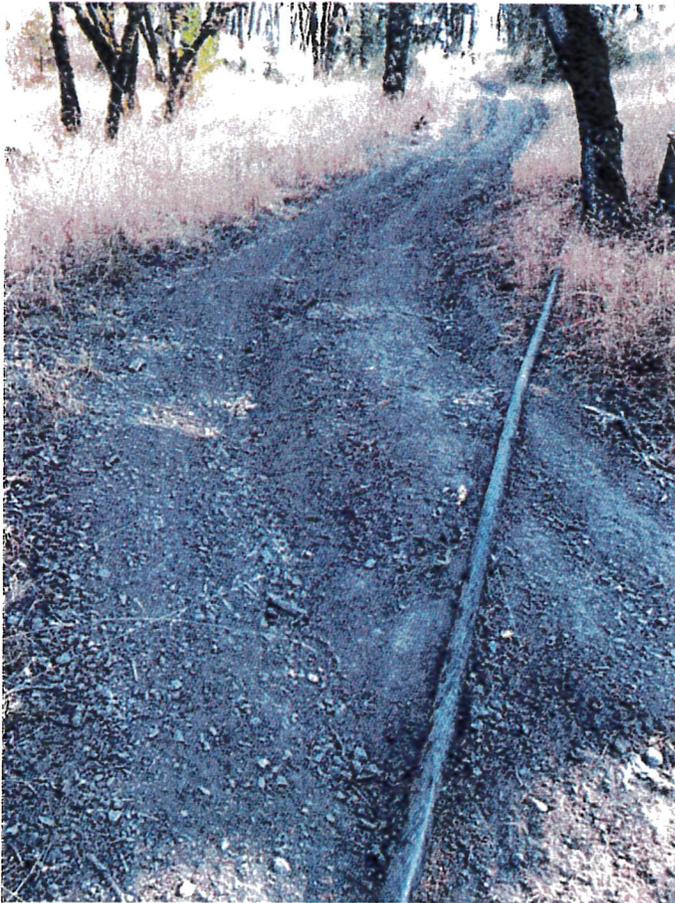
Base of Road 3 where it connects with Road 2 where the upslope road will be decommissioned.
